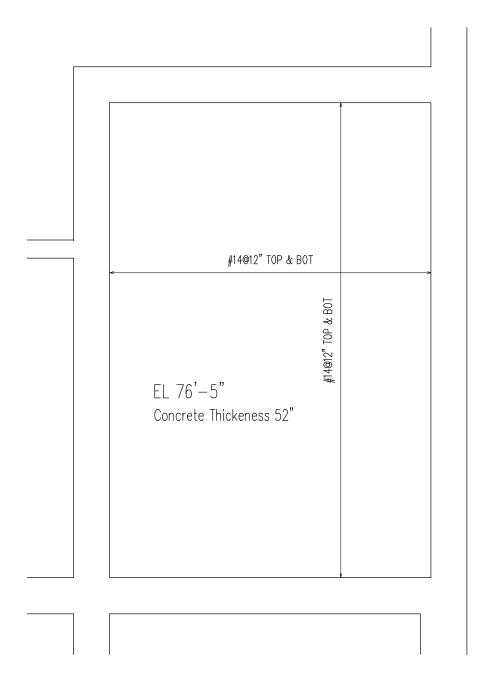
Typical Reinforcement in Emergency Feedwater Pit Slab – AREA 4
